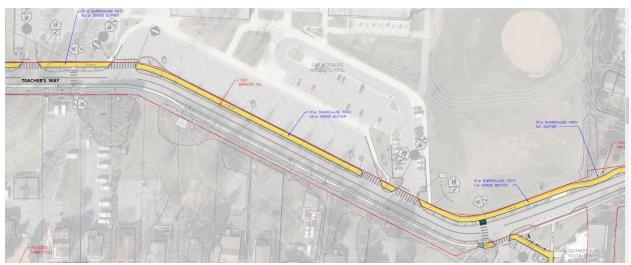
Concept 3, Teachers Way between Melvin St and Girard St
